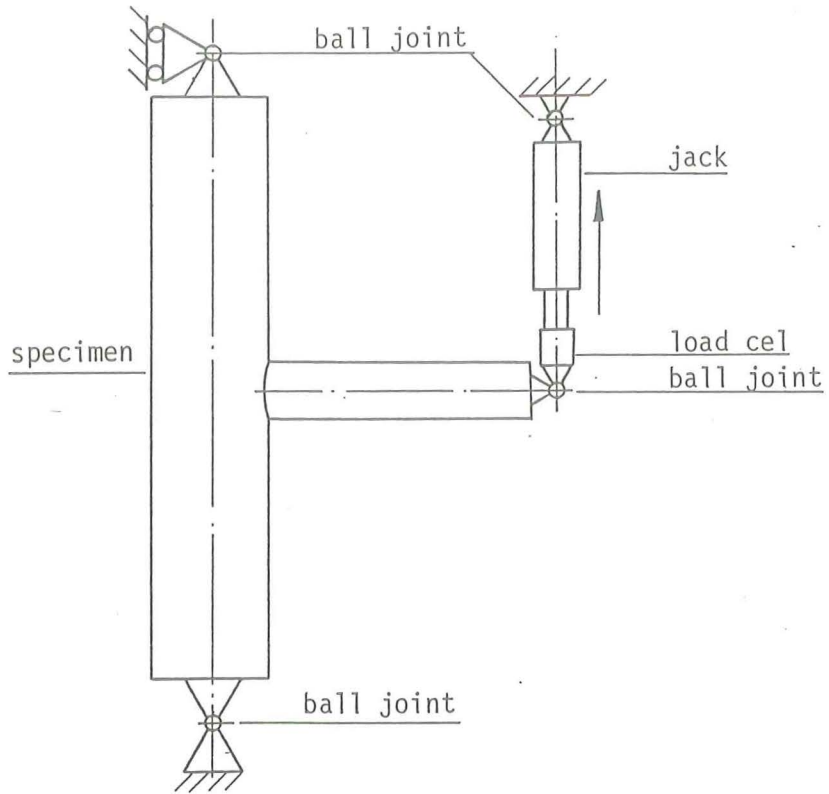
Test rig for $\varnothing 168.3$ mm tubular T-joints (in plane bending)
